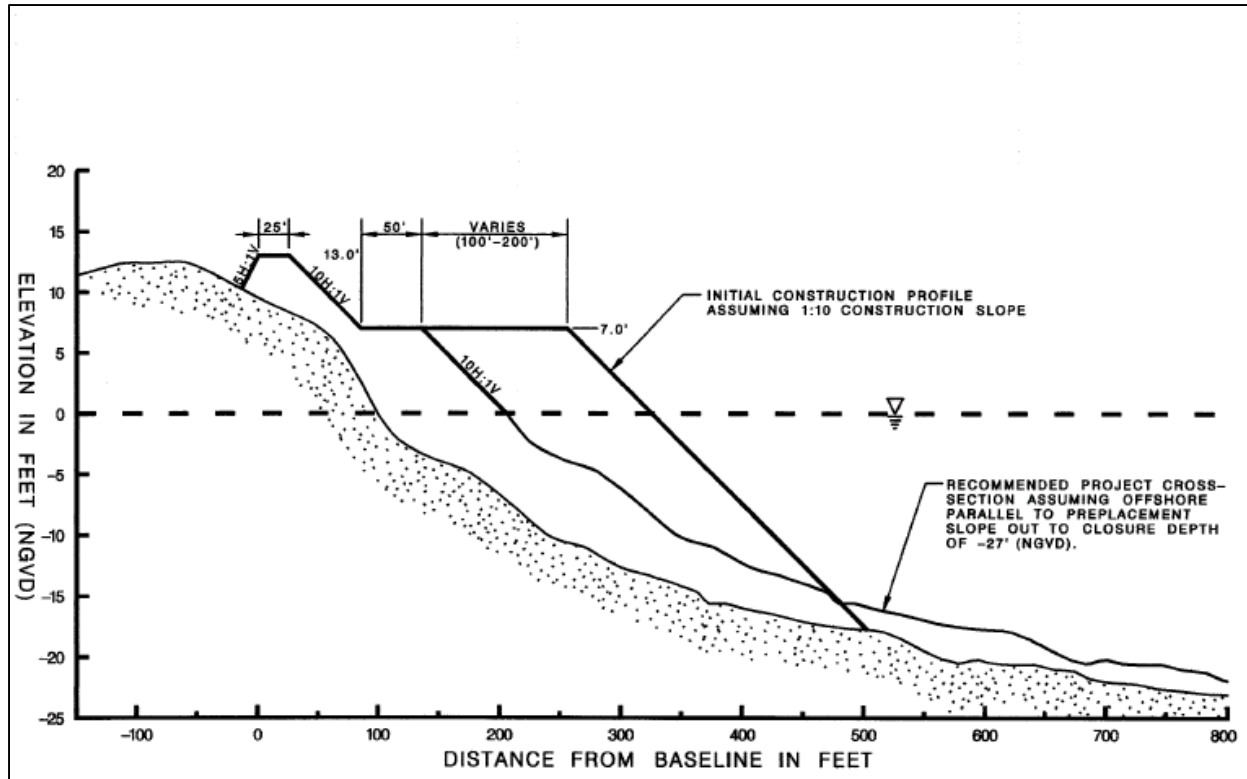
Typical cross section profile of the Federally Authorized North Dare County Project showing both the construction and design templates (Modified from USACE, 2000).
